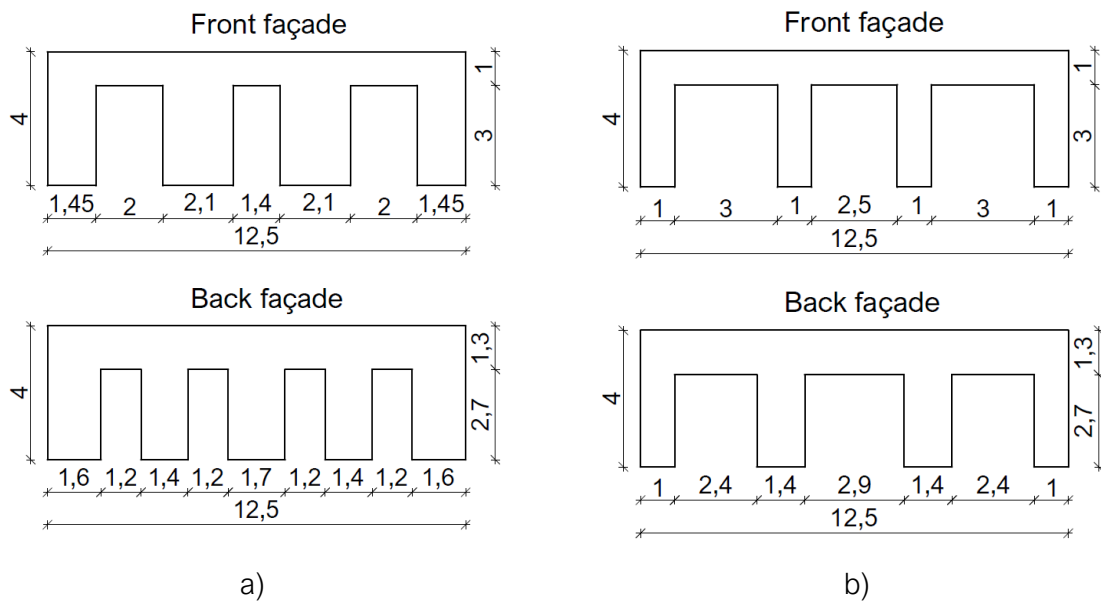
Geometry of the ground floor façade openings of the two numerical models: a) Smaller façade openings and b) Bigger façade openings.
